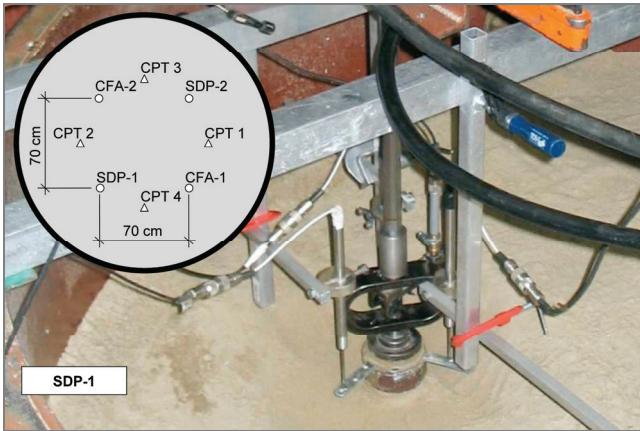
Localization of single piles and CPTs in the container plan and view of a single pile under the loading test
